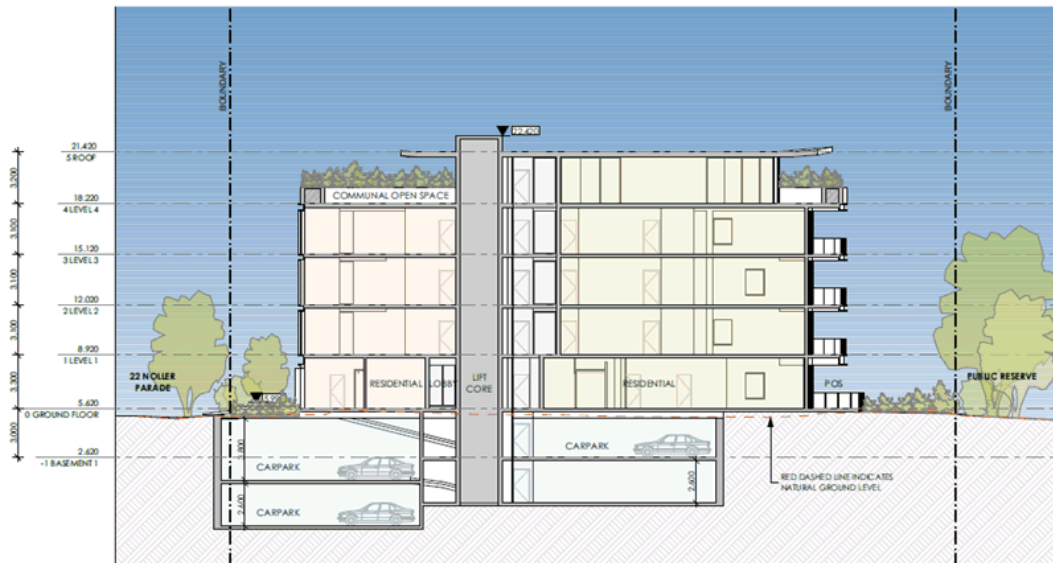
Indicative design elevation of 22 Noller Parade, Parramatta from the east
